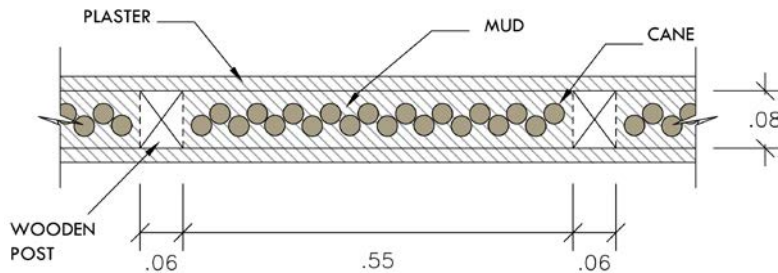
Transversal section of a quincha wall on the third floor of Hotel El Comercio, showing the woven cane and mud mortar.
